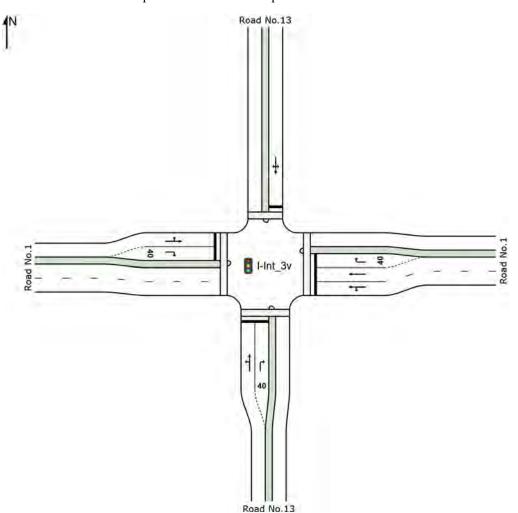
Road No 1 and Road No 13 Proposed Intersection Layout
